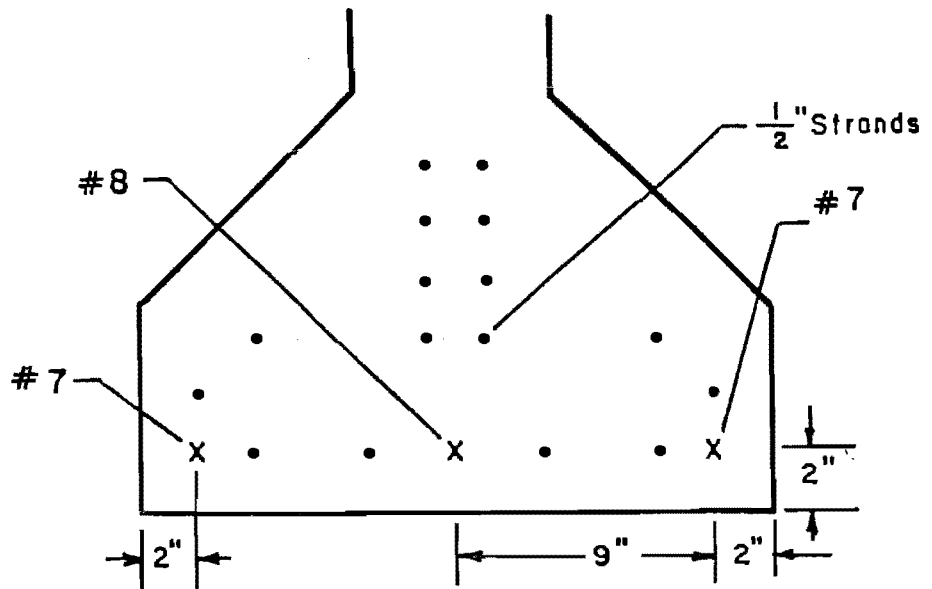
Specimen C-16-UP-8.0-NO-1.73 passive reinforcement layout
